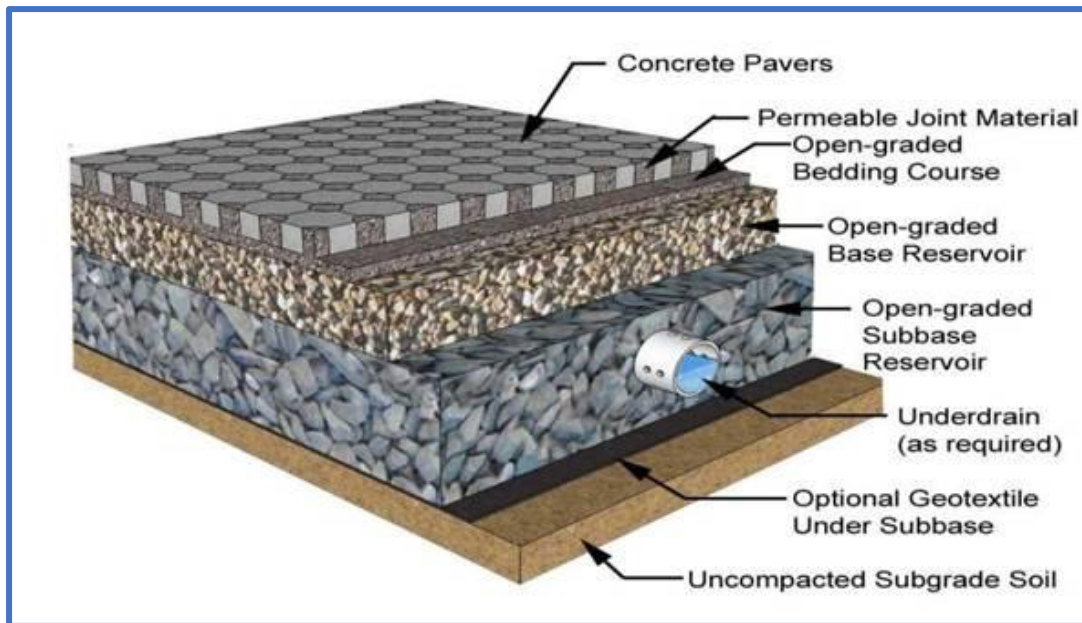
5: Typical section of a permeable pavement (Smith, 2006)
